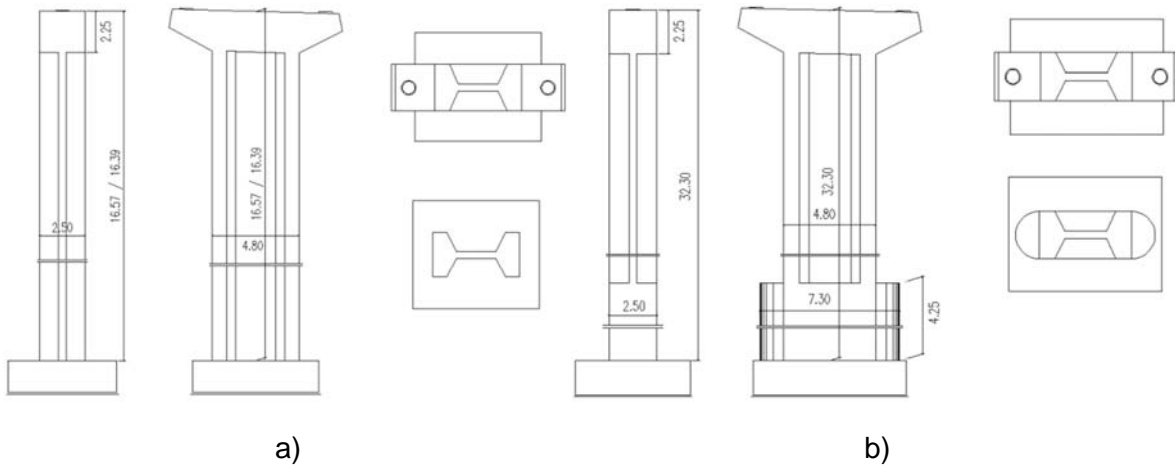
Columns (m) [105]: a) C1 and C4; b) C2.
